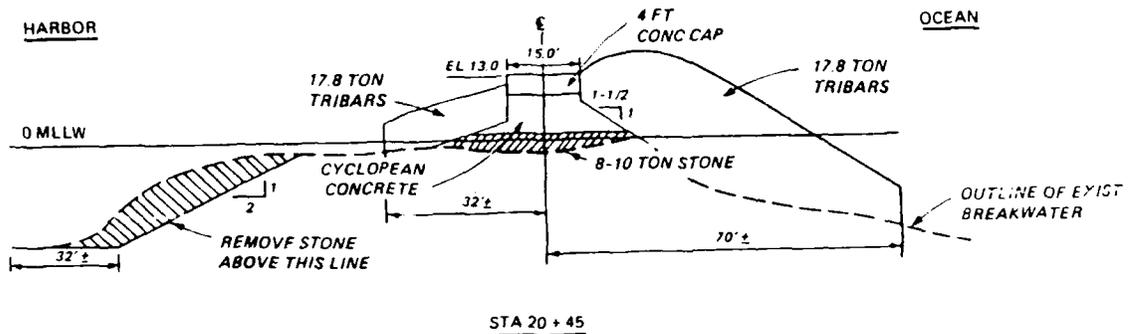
Typical cross sections for 1959 repair of Nawiliwili breakwater
